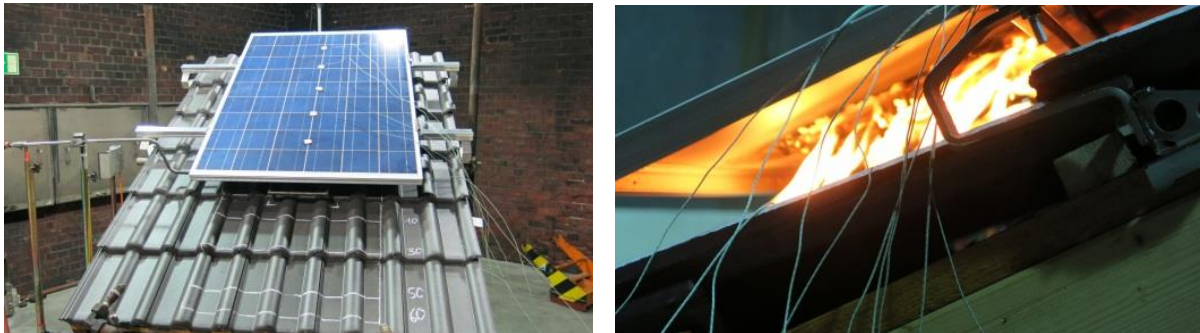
Left: roof-parallel structure with concrete roofing tiles and PV module. Right: the ignition initiator was placed between the module and the roof surface.
